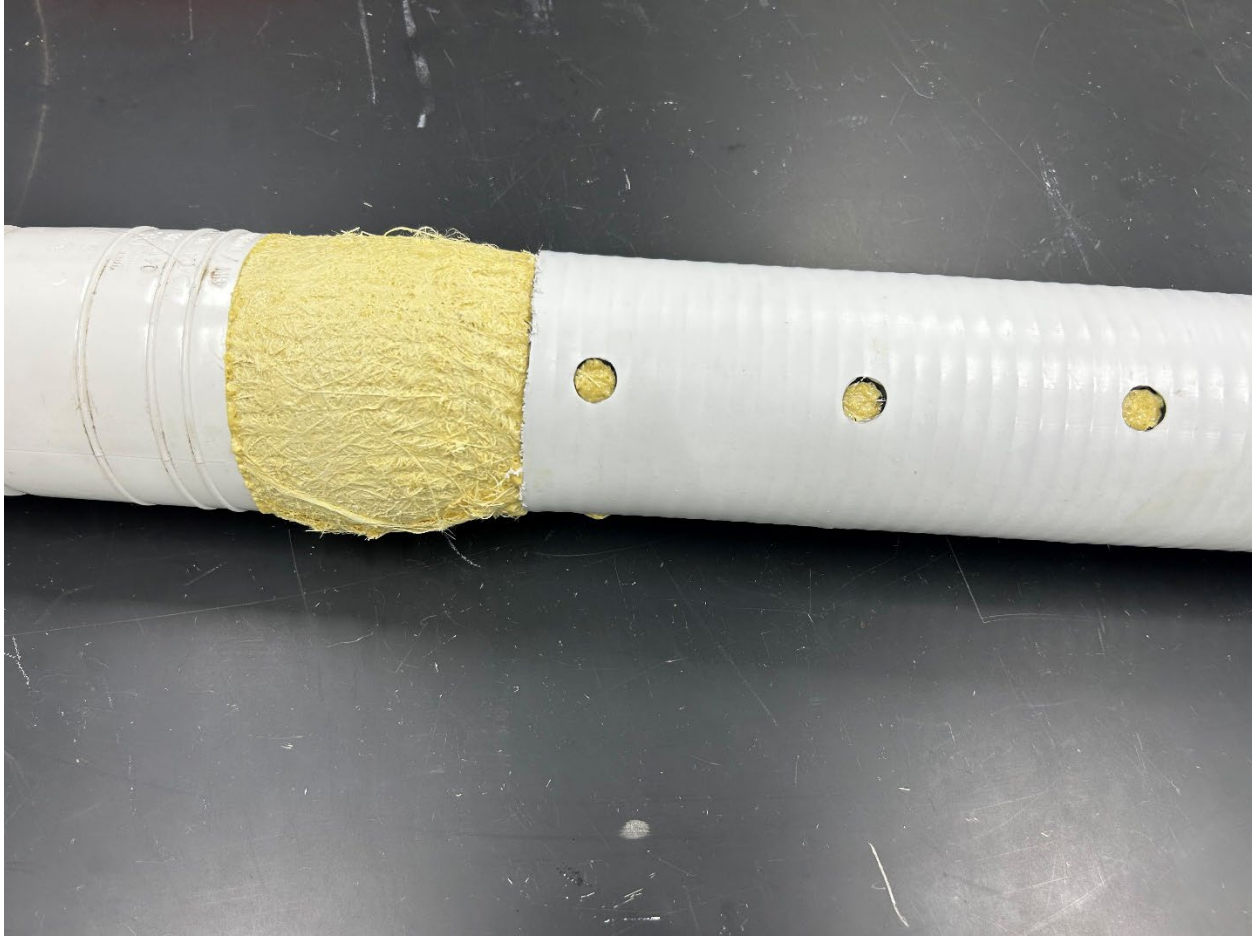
FRP repair using a pipe packer to provide structural lining repair to a damaged section of pipe.
